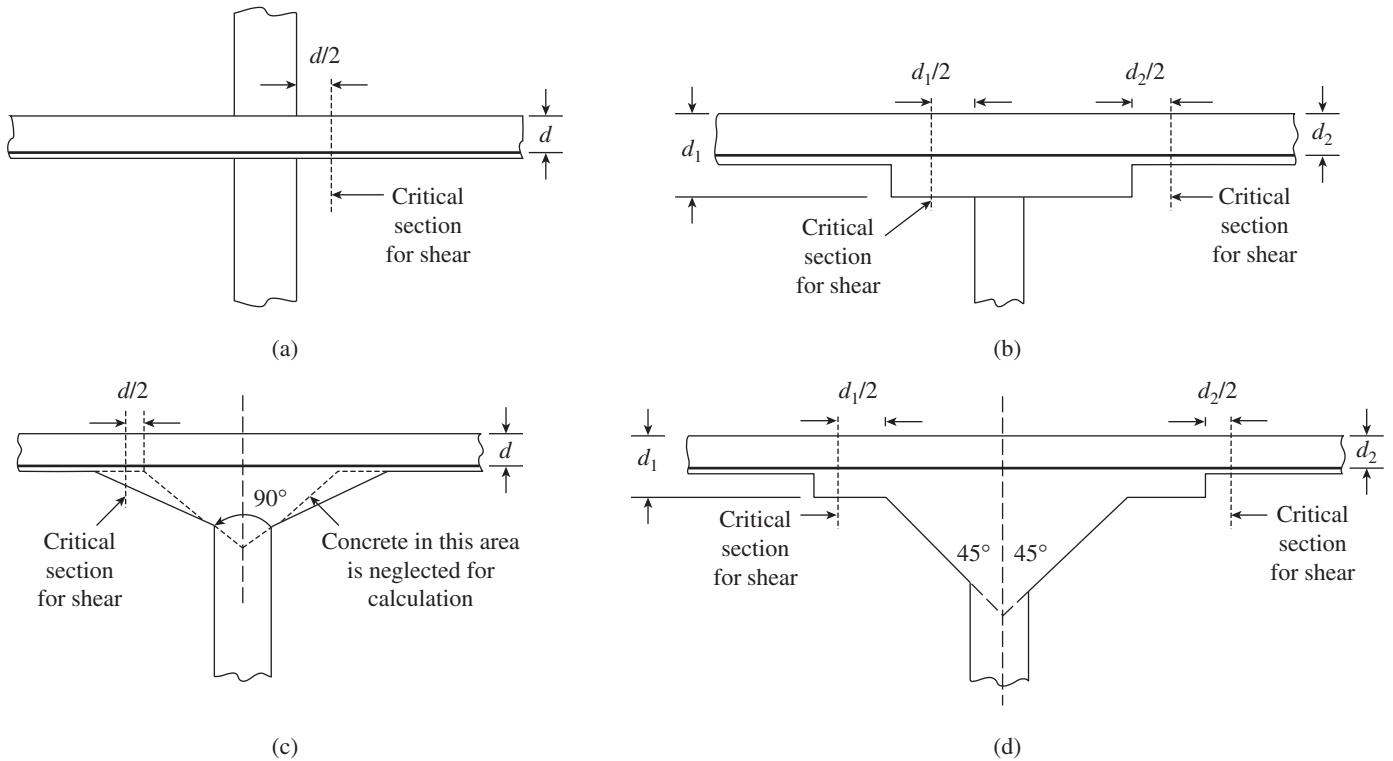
Critical sections for two-way punching shear (a) Flat slab without drop and column head (b) Slab with drop but without column head (c) Slab without drop but with column head (d) Slab with drop and column head
